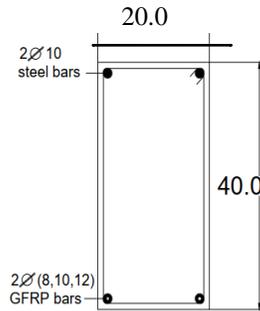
Beam Cross-Sectional Area and Reinforcement Detailing
